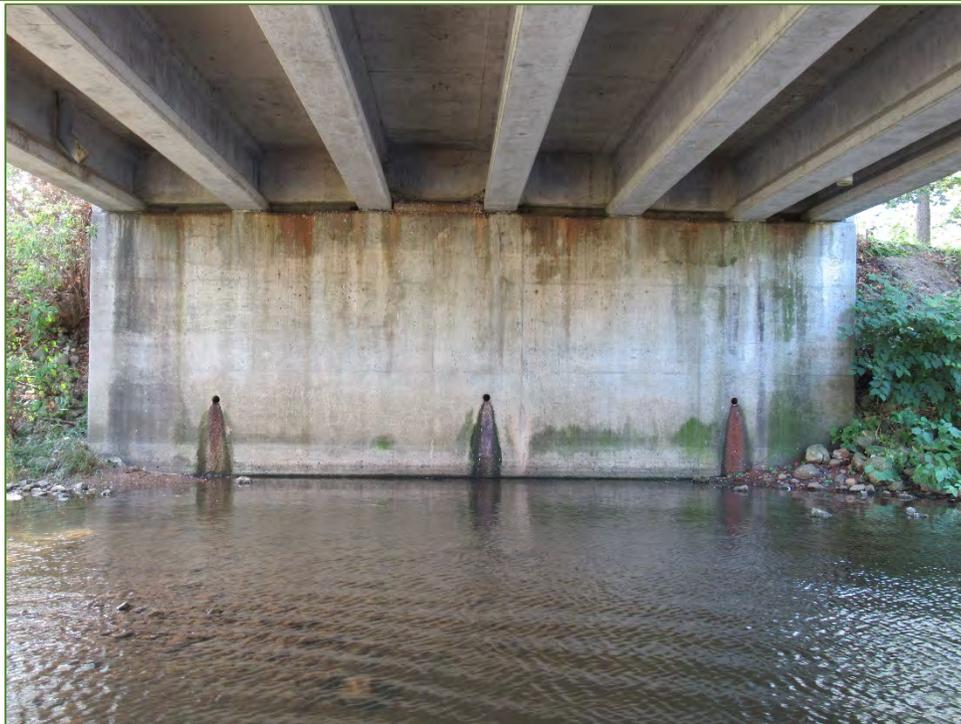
West Abutment (fair to good condition – cracks and wet area)
